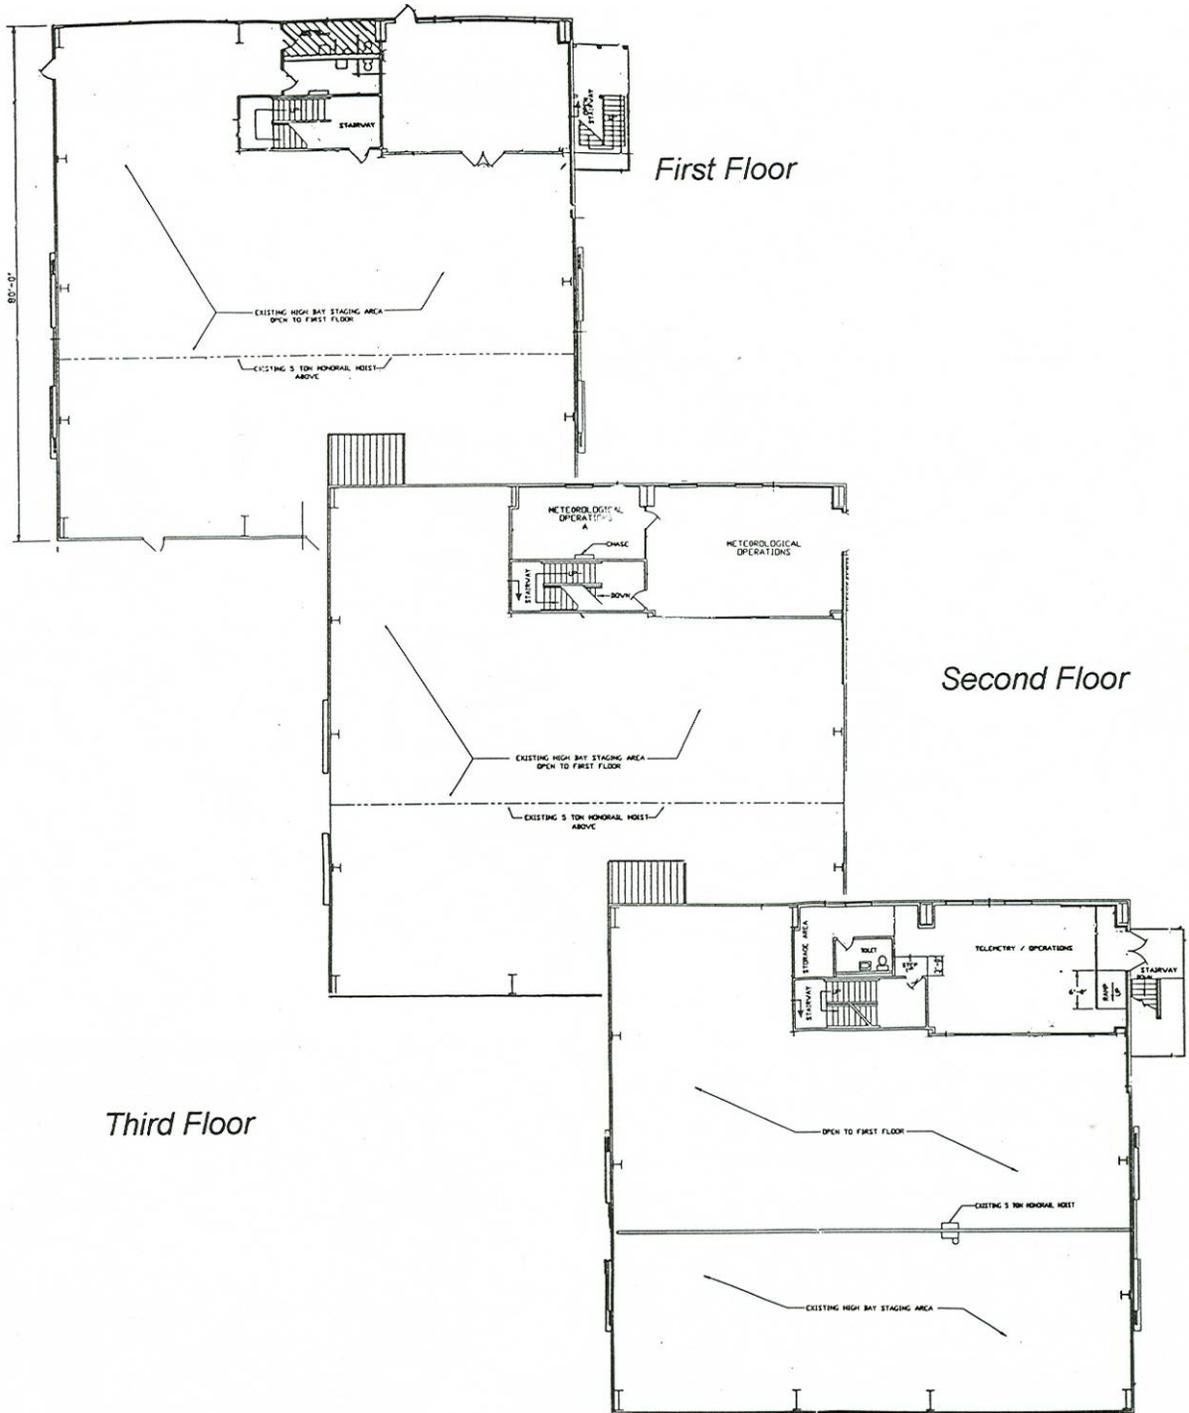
Fort Sumner Staging (Building R1) Floor Plan
